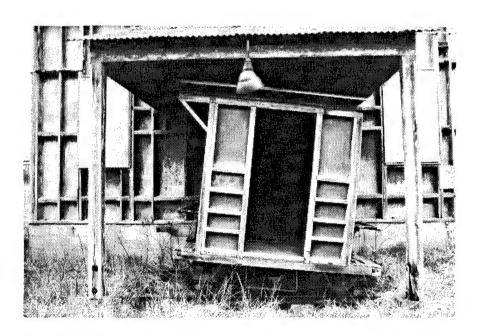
Building 239-2: Trolley on the east side of the Shaker Sieve House.
